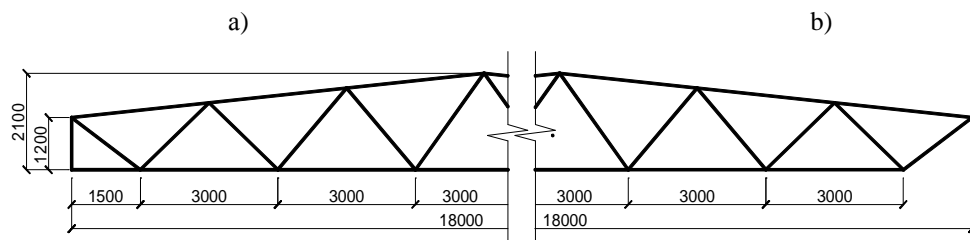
The studied trusses: a) the lower bearing type; b) the upper bearing type
